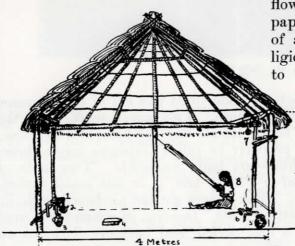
El Encanto, Chis. Section of Bachajon House.
